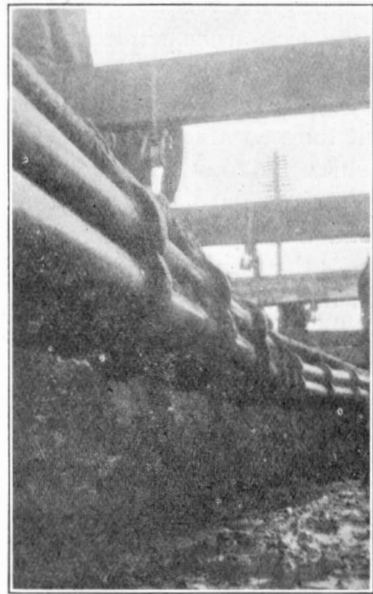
DUCTS SUSPENDED ON CURVED SECTION. PLANKS ON EDGE USED FOR CROSS-TIMBERS INSTEAD OF OLD POLES.
